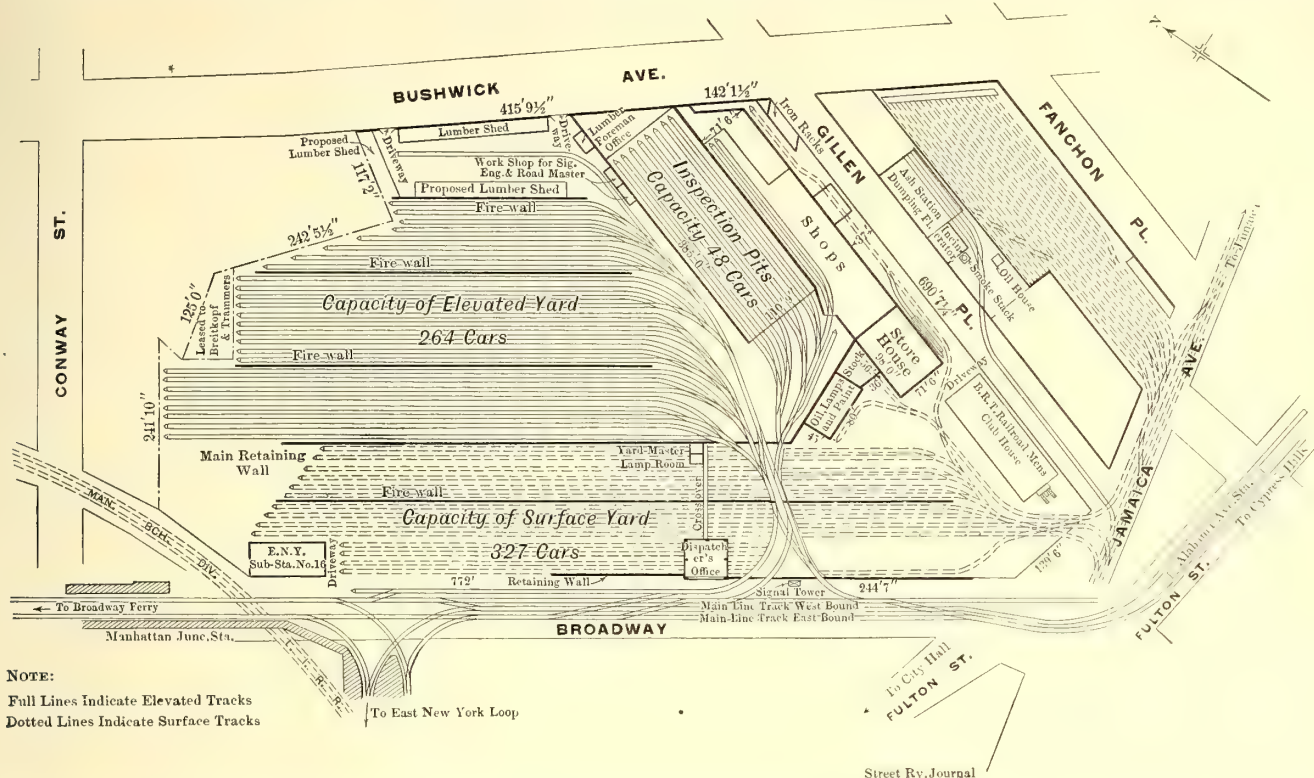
GENERAL LAY-OUT OF THE TRACKS AND BUILDINGS OF THE EAST NEW YORK INSTALLATION
